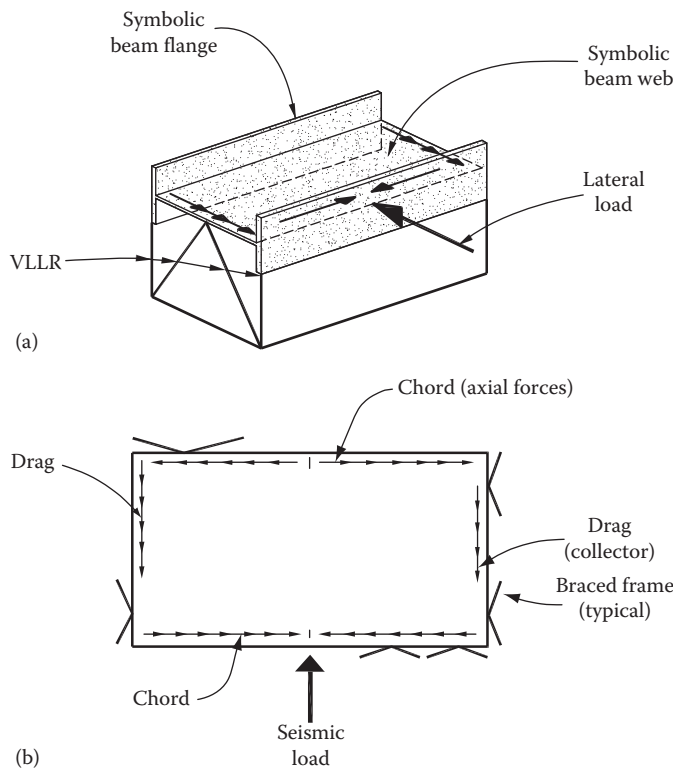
(a) Diaphragm action of floor or roof system. *Note:* VLLRS. (b) Schematic drag and chord for north–south seismic loads.
